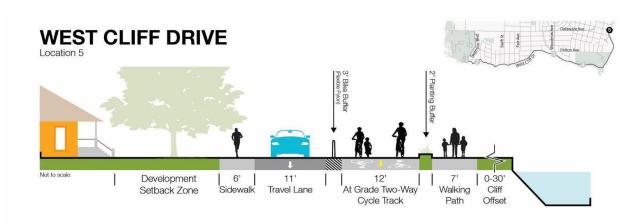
Alternative 2 Concept- Cross Section of Santa Cruz St at West Cliff Drive
